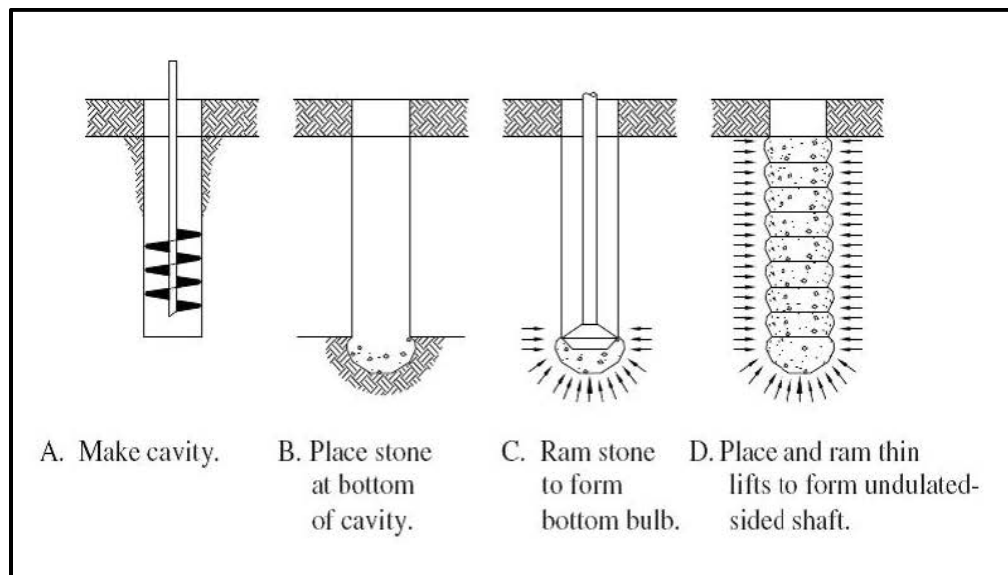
, Geopier® Rammed Aggregate Pier™ (Geotech Tools (2012))
